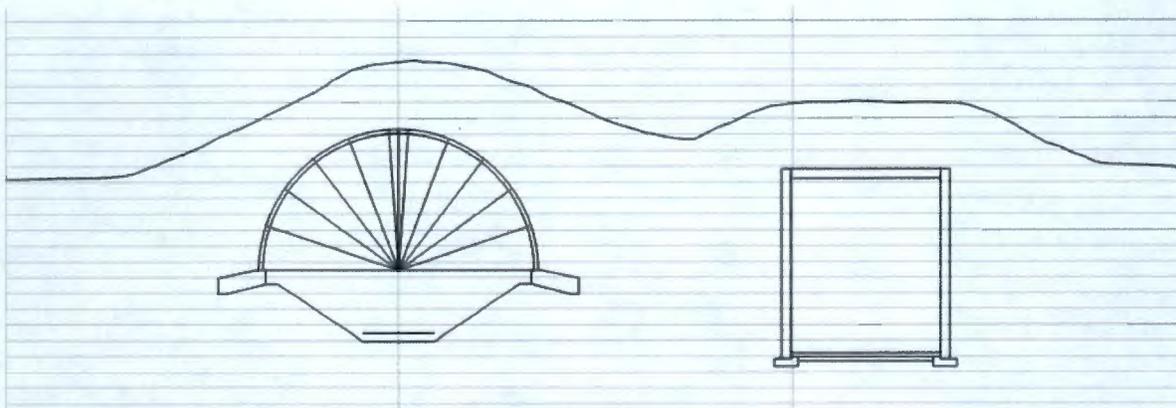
Cross Section at STA 4+00, looking south, showing geometry of Tunnel 1 (right), Tunnel 2 (left), and Tunnel Cover Soil Topography
